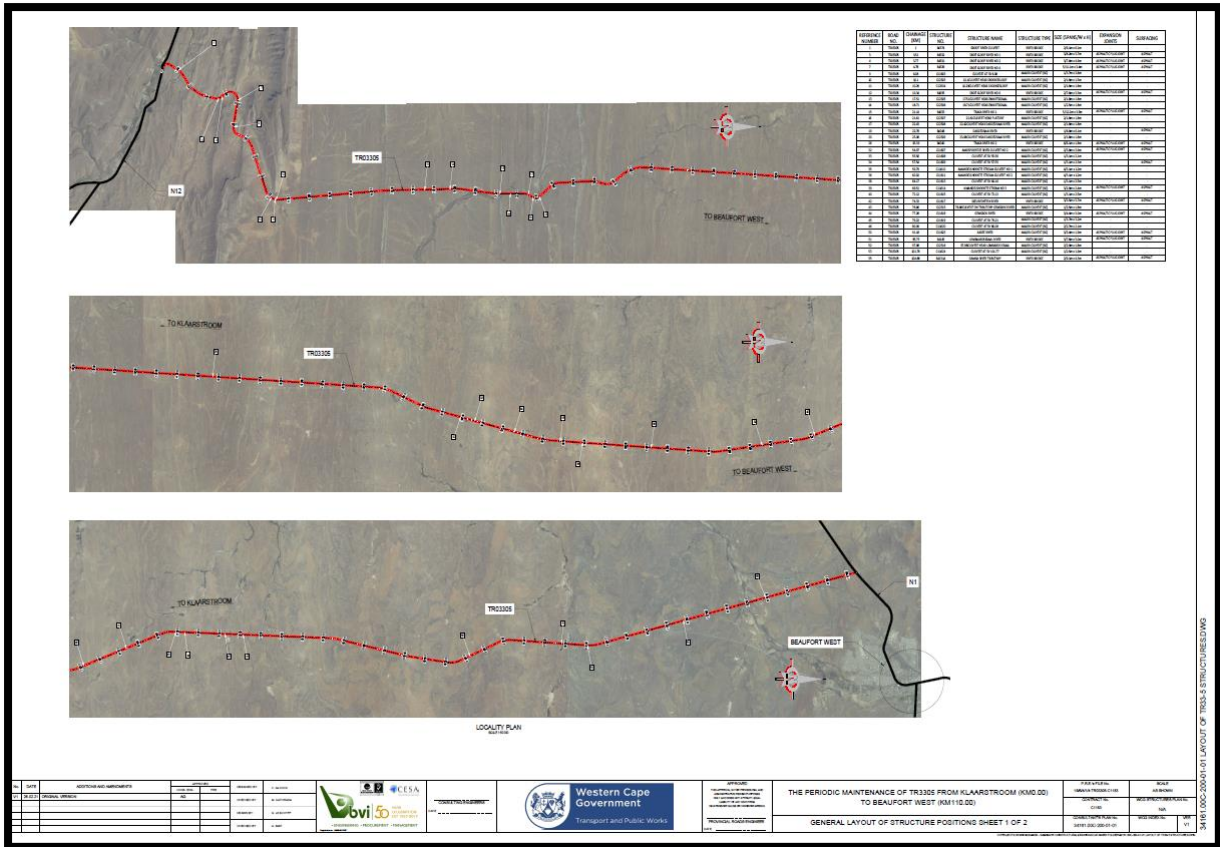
Figure showing bridge and culvert positions (Chameleon).
